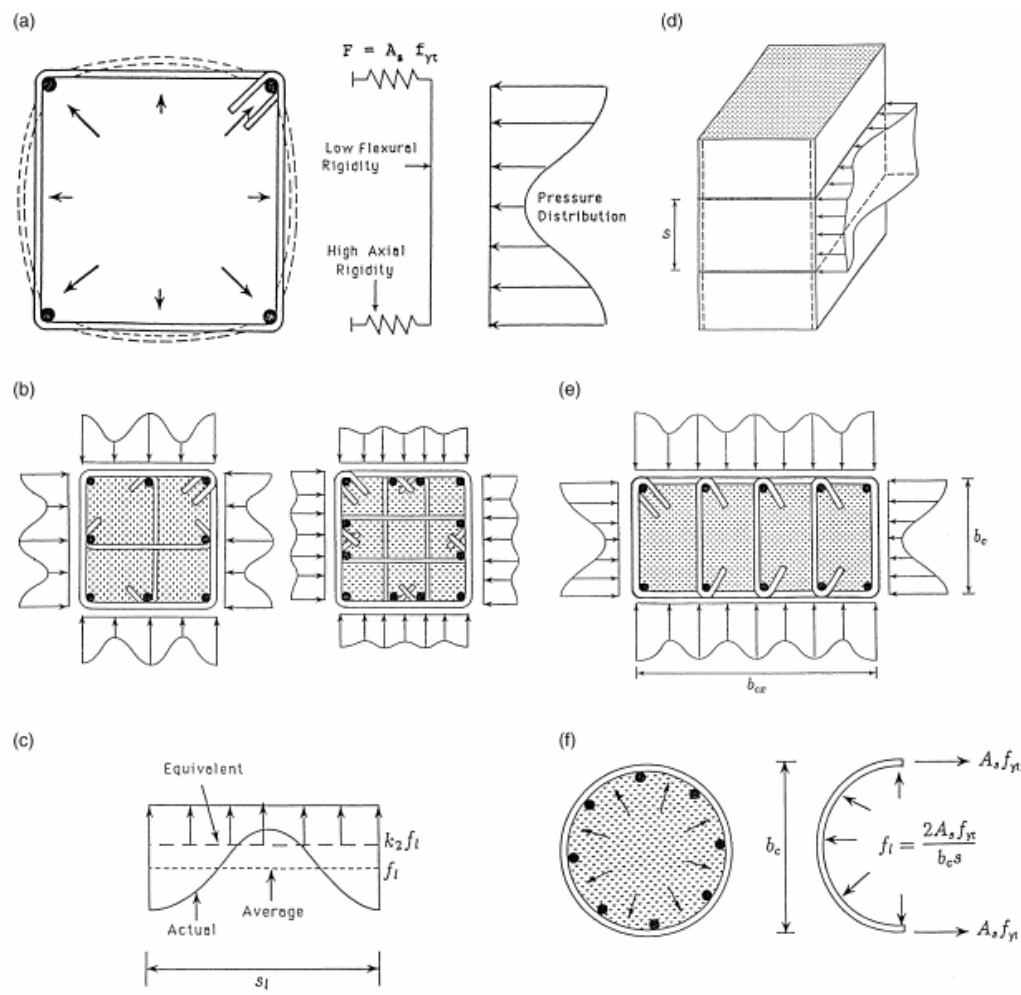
Confinement pressure resulting from different reinforcement arrangement
